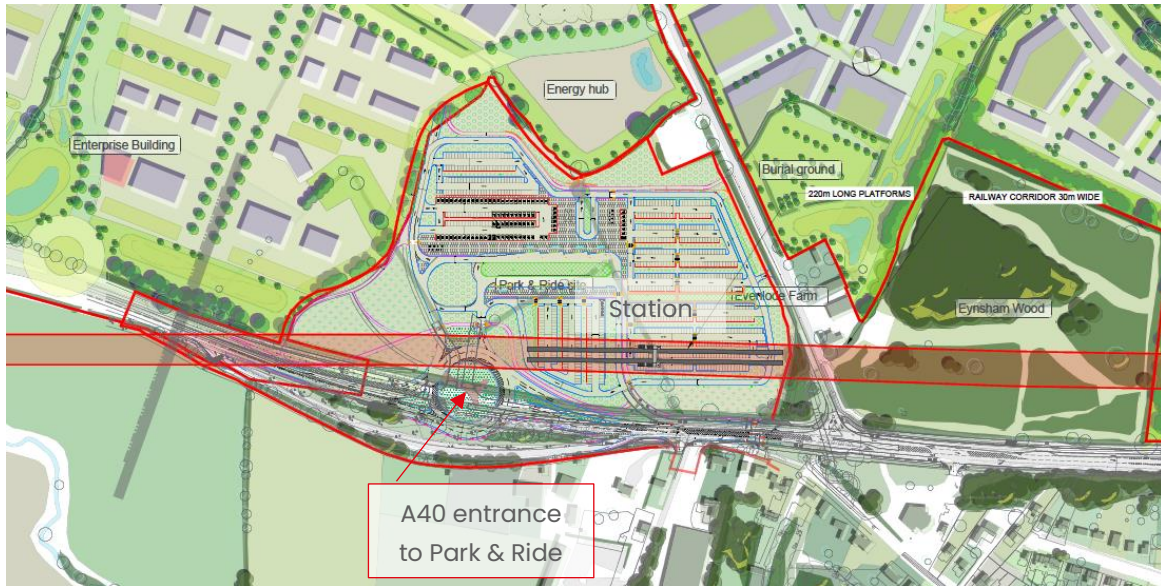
Plan View of a potential A40 flyover and Park and Ride/Eynsham Station location
